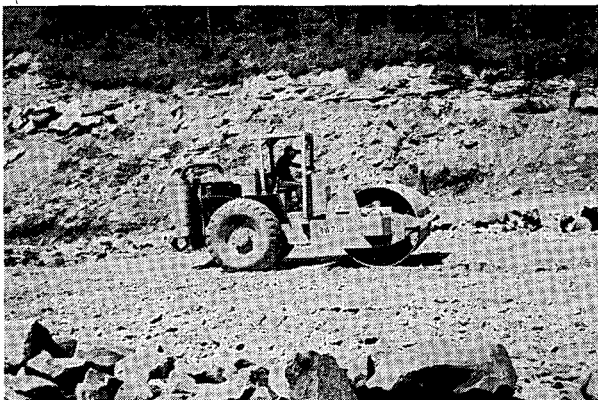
Buffalo-Bomag 10-ton vibratory roller.
